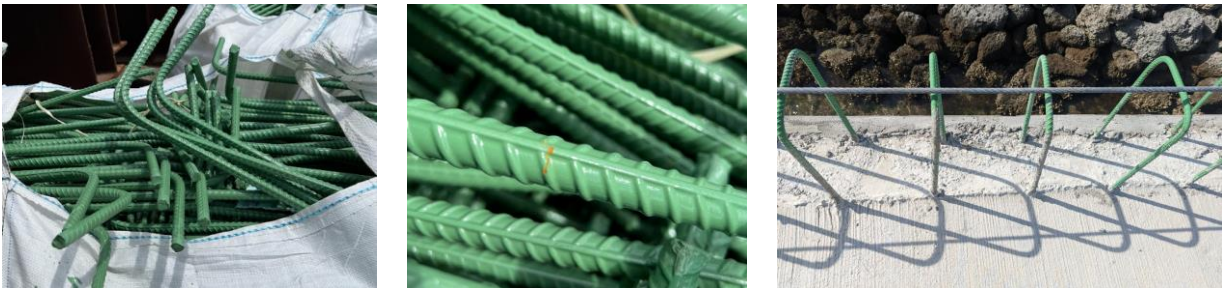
Epoxy-coated bars reinforcing the parapet rail
